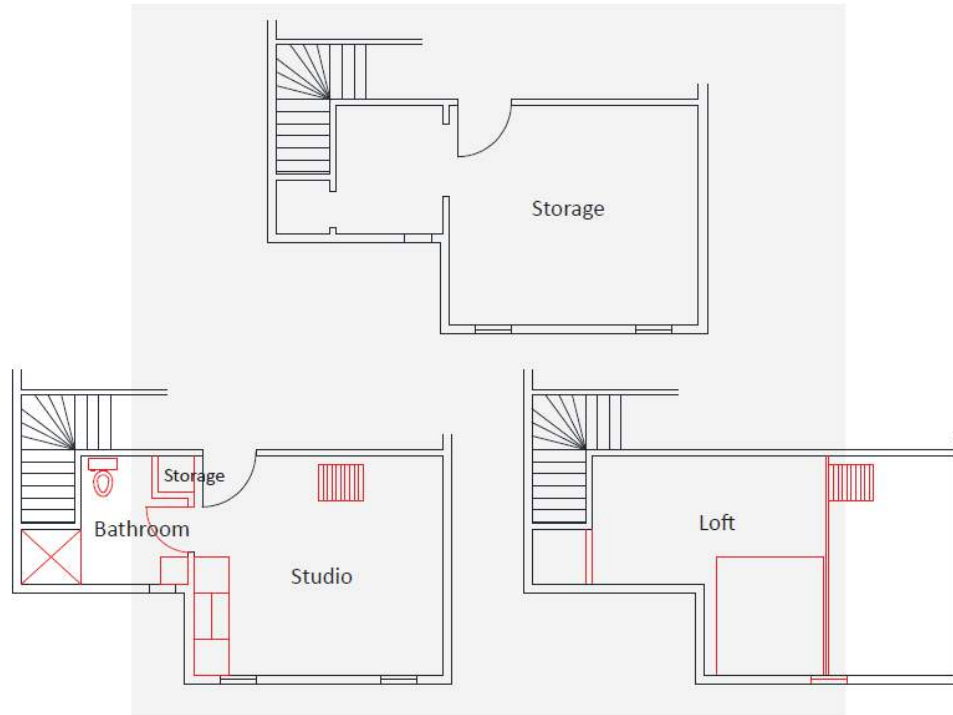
Existing and Renovation Plans 513 N 2nd Ave E, Duluth MN.
